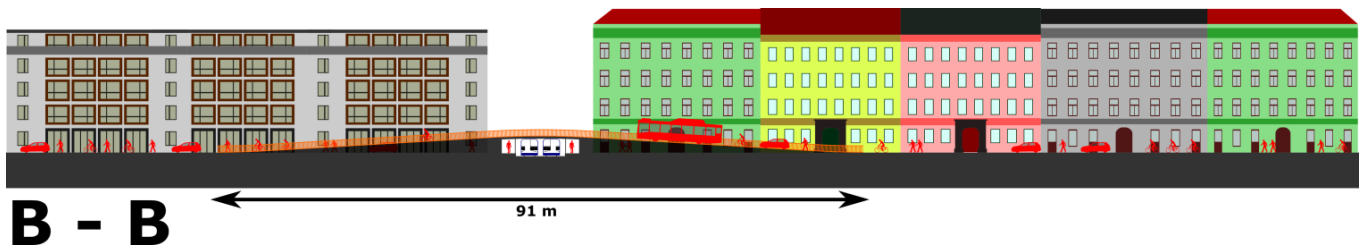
Longitudinal section through a road, crossing the LCRT line with a shallow underpass
